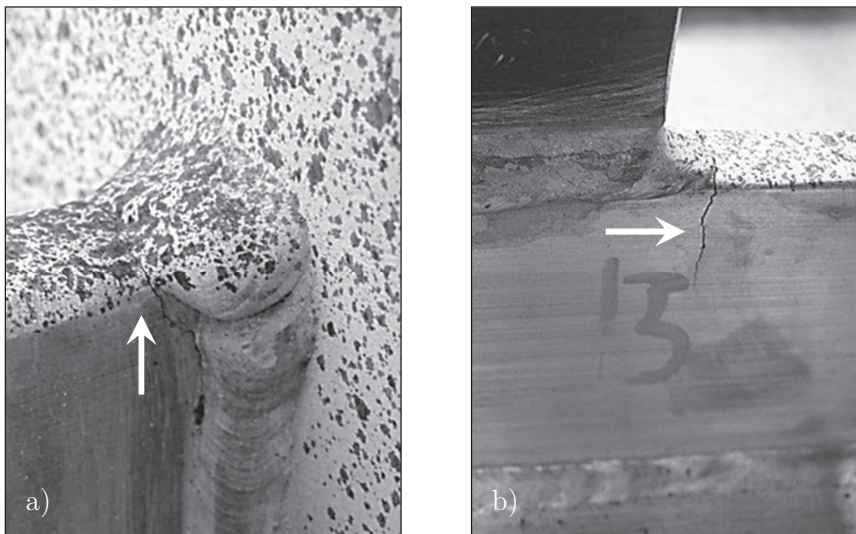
Cracks in LSS 1 at a) loc. 1 and b) loc. 2.
